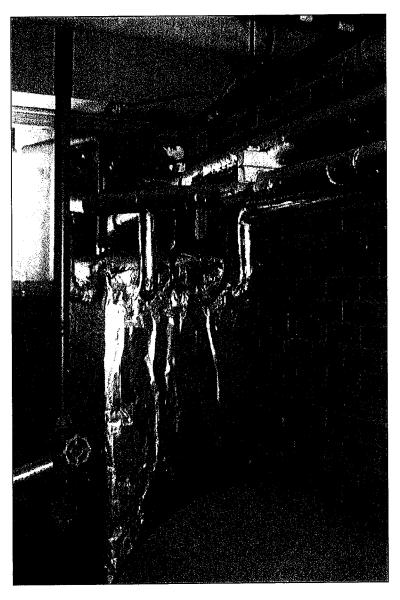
SMF / Foil Insulation to Pipework - Plant Room 9
